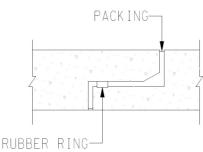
Butt end type with mild steel band and socketed in-wall rubber ring type
